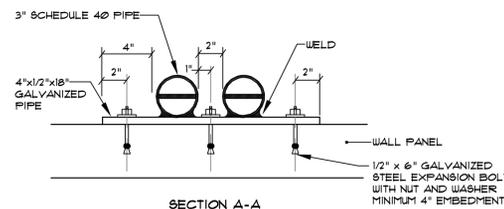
DETAIL ELEVATION OF RAIL MOUNTING BRACKET
